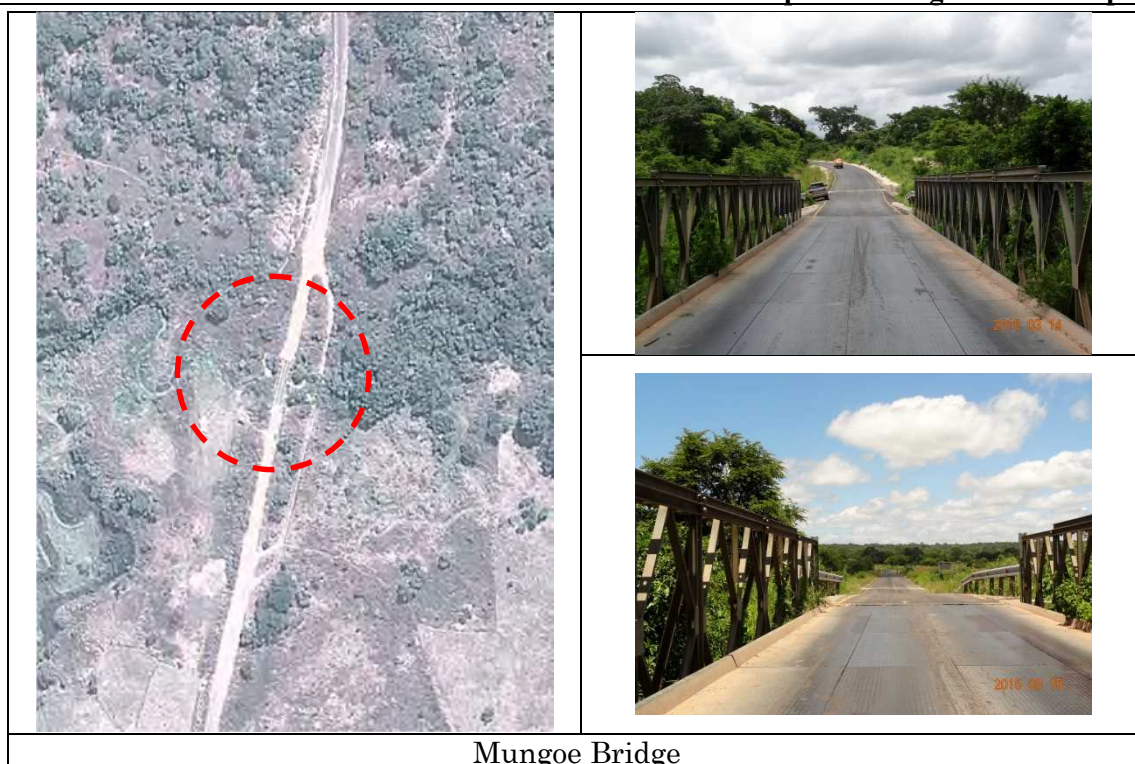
Present Situation of Surrounding Area of Bridges
